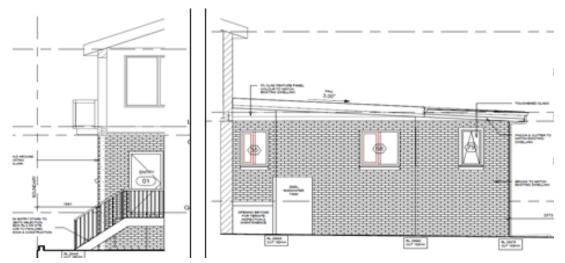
South elevation/entry (left) and east elevation/rear (right) refused by Council
